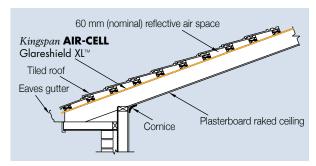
Side elevation of *Kingspan* AIR-CELL Glareshield XL™ in a tiled roof with a raked ceiling
